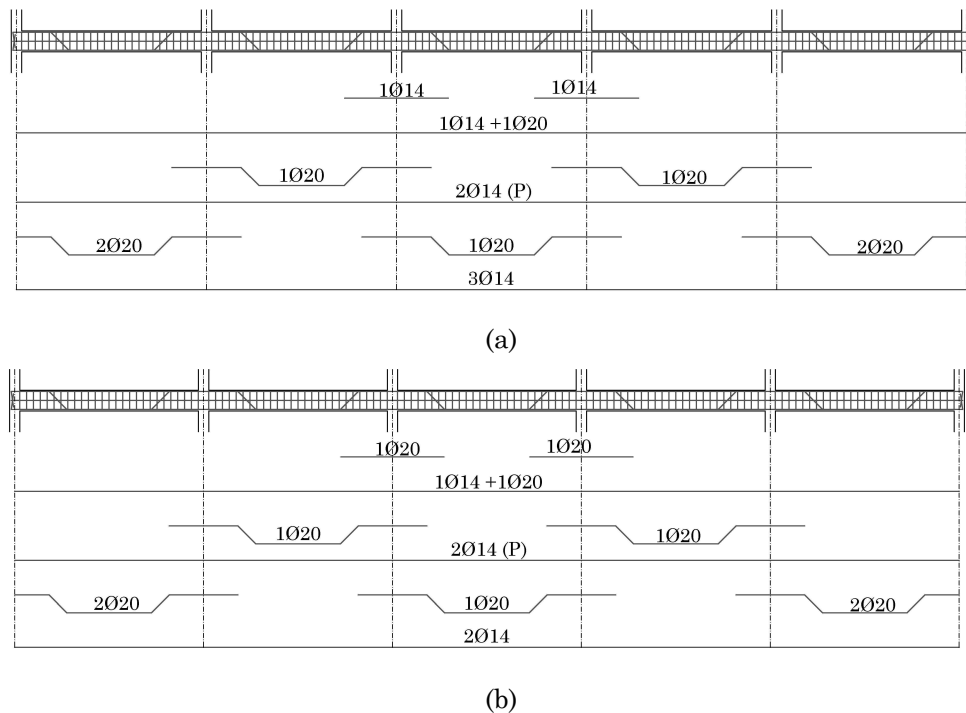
Arrangement of rebars of beams at a generic floor of GL frame: (a) 9-storey frame; (b) 6- and 3-storey frame
